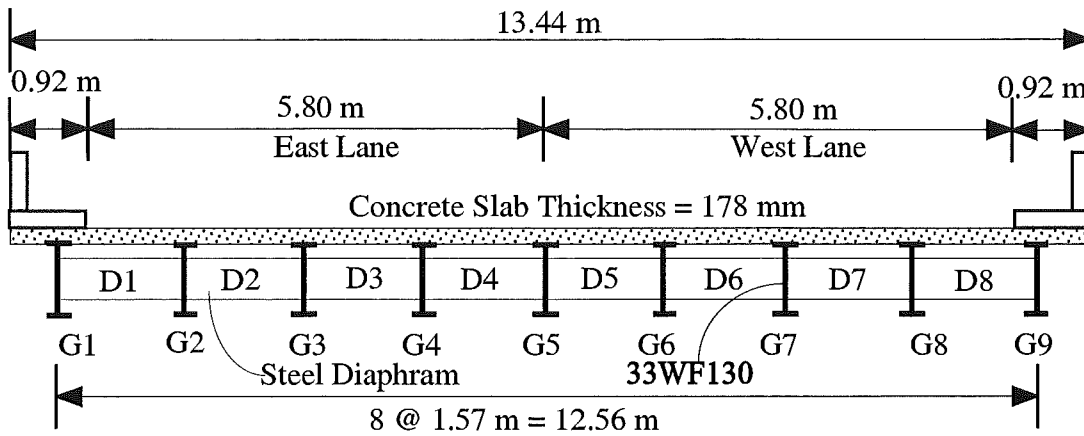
Cross-Section of the Bridge M52/BC (B02-46071).
